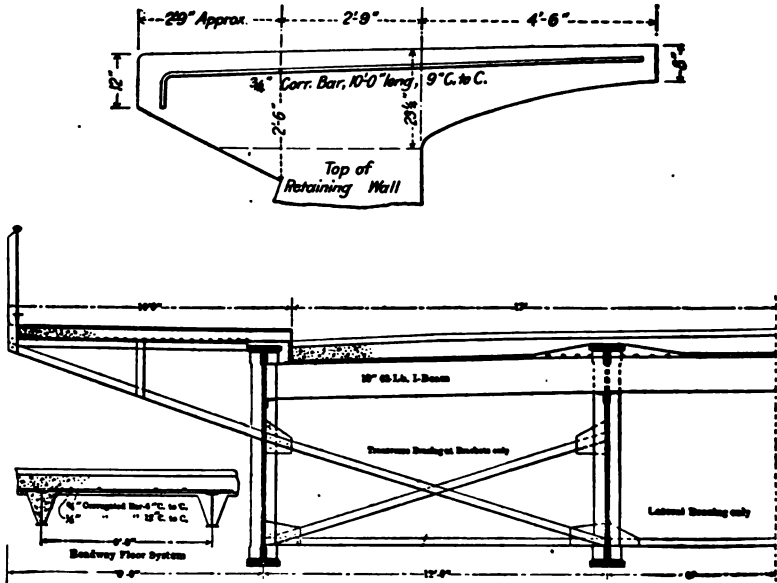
Highway Bridge Floor, South Bend, Ind.
